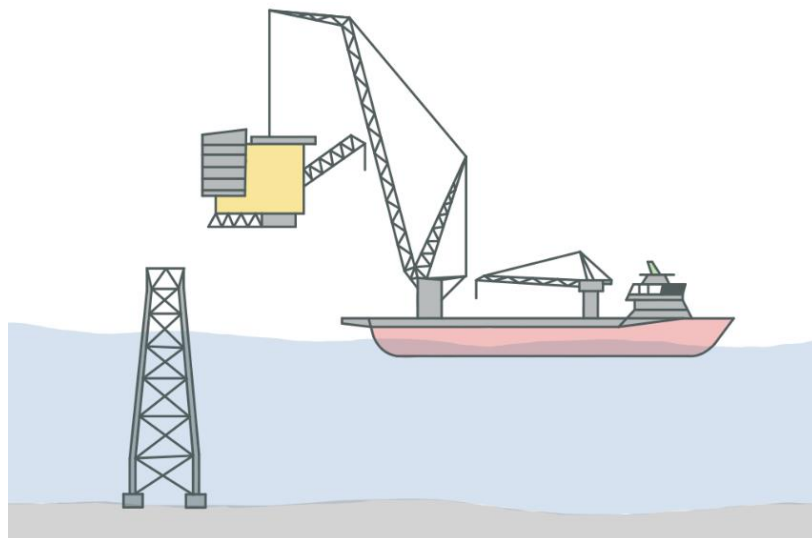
Installation of an Offshore Substation on a Jacket Foundation
